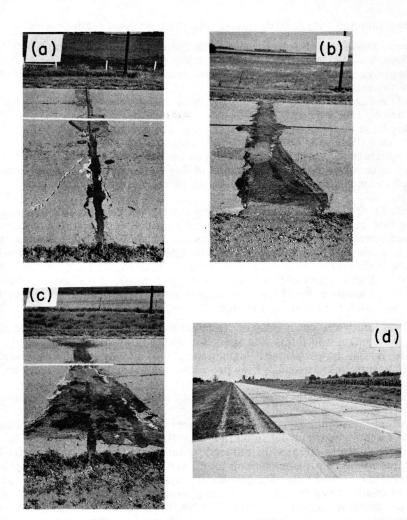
Typical deterioration at transverse joints, as follows: (a) joint deterioration, 15-ft panels, no dowels, Div. 8, Sta. 379 + 80; (b) expansion joint between Div. 8 and 9, Sta. 400 + 50, 25-ft panels to the left, 15-ft panels to the right; (c) patched joint, 25-ft panels, no dowels, Div. 9, Sta. 414 + 45; and (d) 30-ft reinforced panels, all joints doweled, Div. 17, Sta. 612 looking west.
